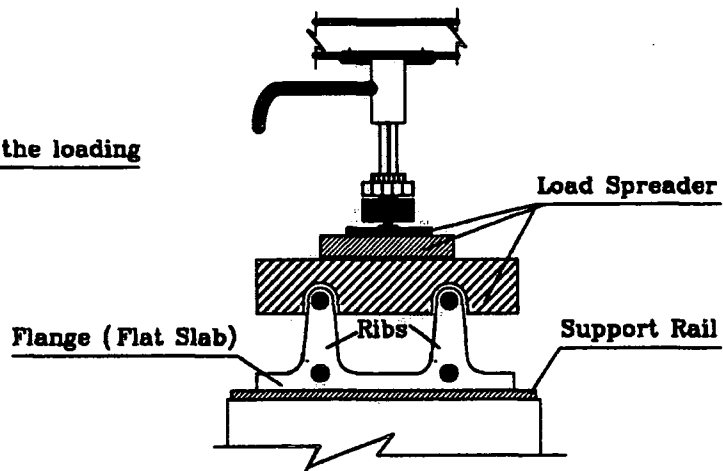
Loading and Instrumentation arrangement of the Phenolic Concrete Test Panels.
